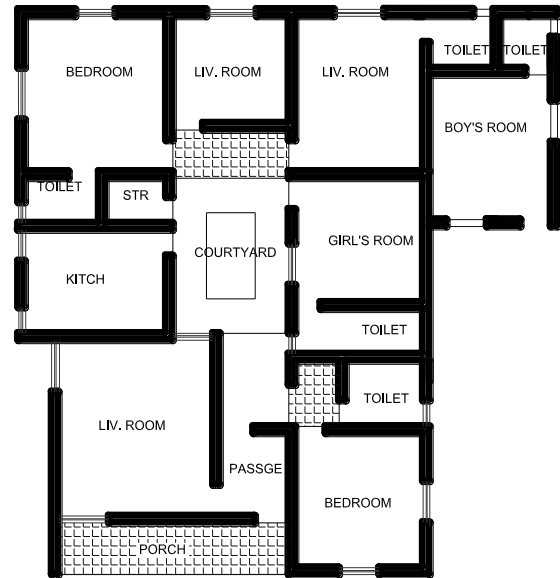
(c) Example of a modified floor plan documented from house samples in *Goruba road* housing estate in which dissatisfied owners added two more bedrooms, enlarged the kitchen and integrated adolescent boy's room. (Source; Author's Survey, 2011)
